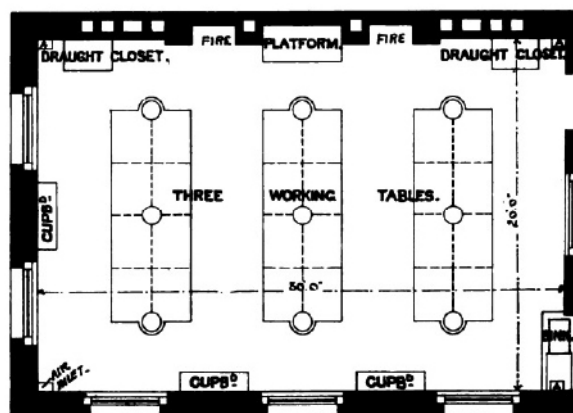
Plan of the chemistry laboratory at the North London Collegiate School, built in 1885. Plate 52, Ref. 18.
